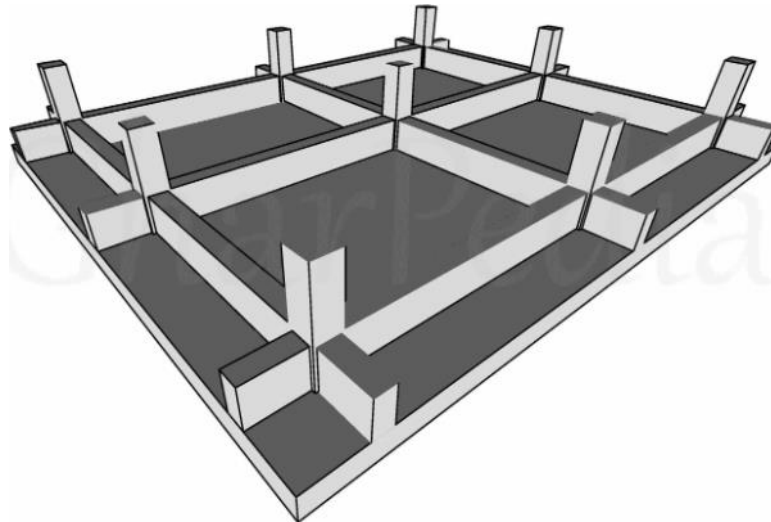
Two-way beam and slab. (Bowels, 1996)
